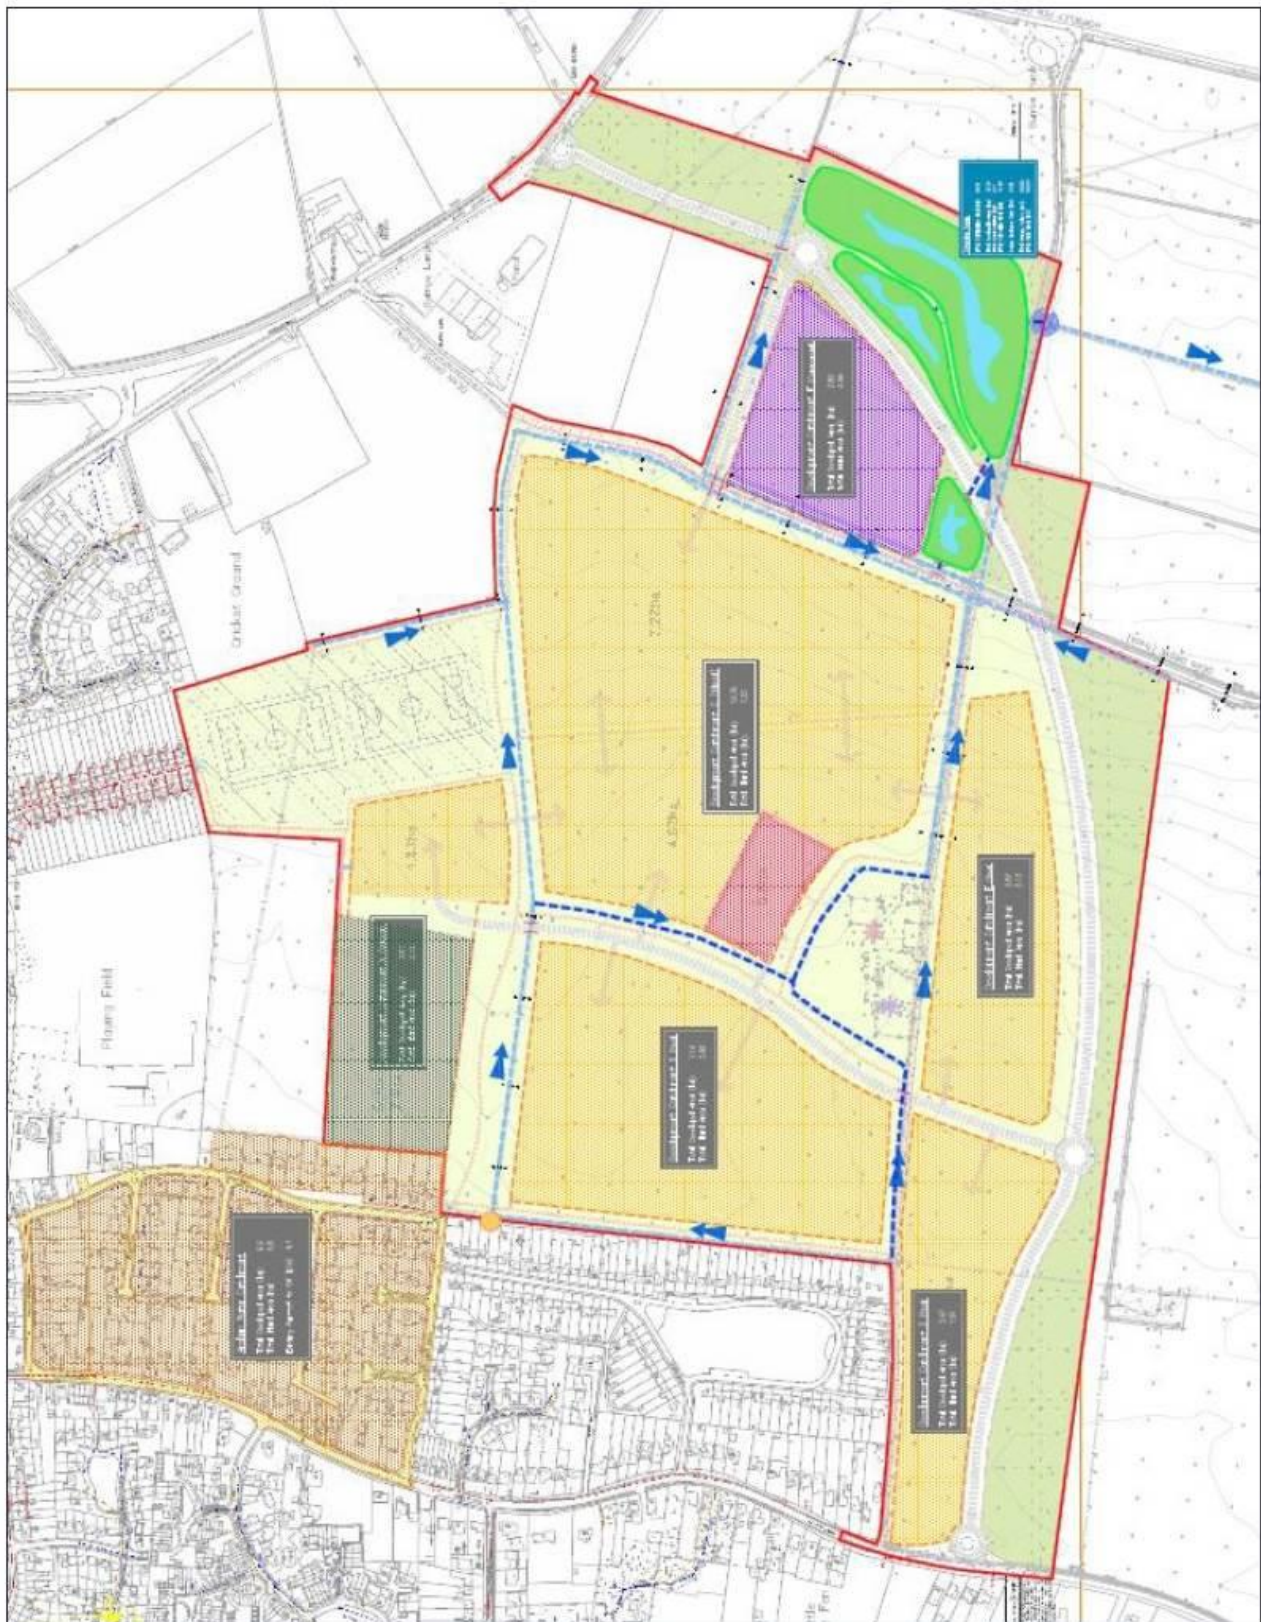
Extract Illustrative Surface Water Drainage Strategy Plan ref 10048-DR-02 Rv05
